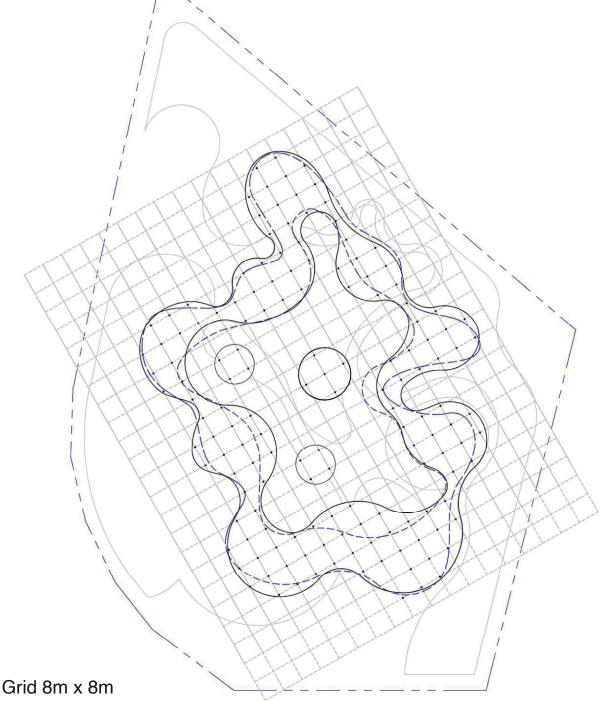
Adjusments on the Form and Floor Plans According to the Steel Frame Construction Grid
